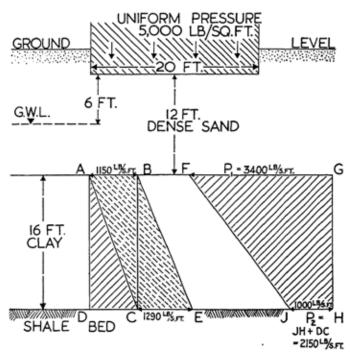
Pressure under Centre of Foundation. (Problem 87.)
